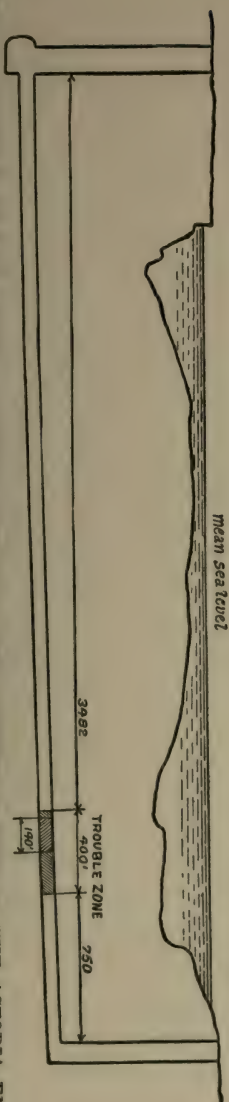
PROFILE OF THE TUNNEL, SHOWING HOW IT SLANTS DOWNWARD TOWARD THE ASTORIA END.
